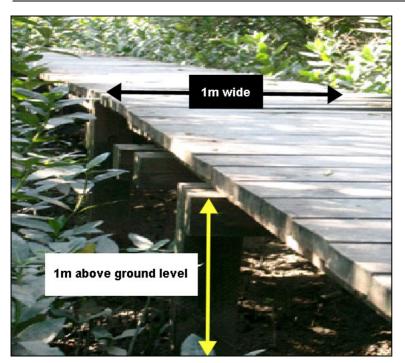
Fixed Boardwalk Design for Options A, B (last 30m section) and C.
